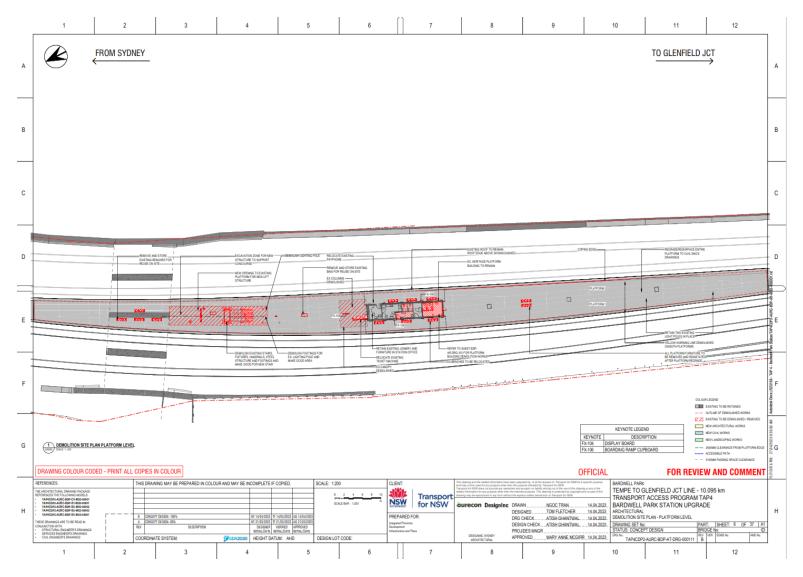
Proposed demolition plan for Bardwell Park Station (Source: Aurecon, 2024)
